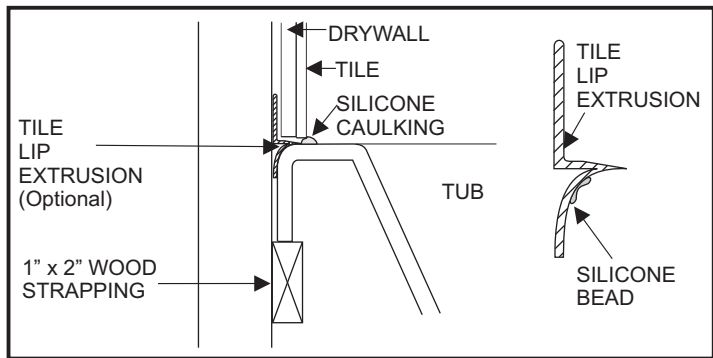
DROP-IN TUB IN ALCOVE INSTALLATION. WOOD STRAPPING, TILE LIP EXTRUSION AND WALL COVERING
